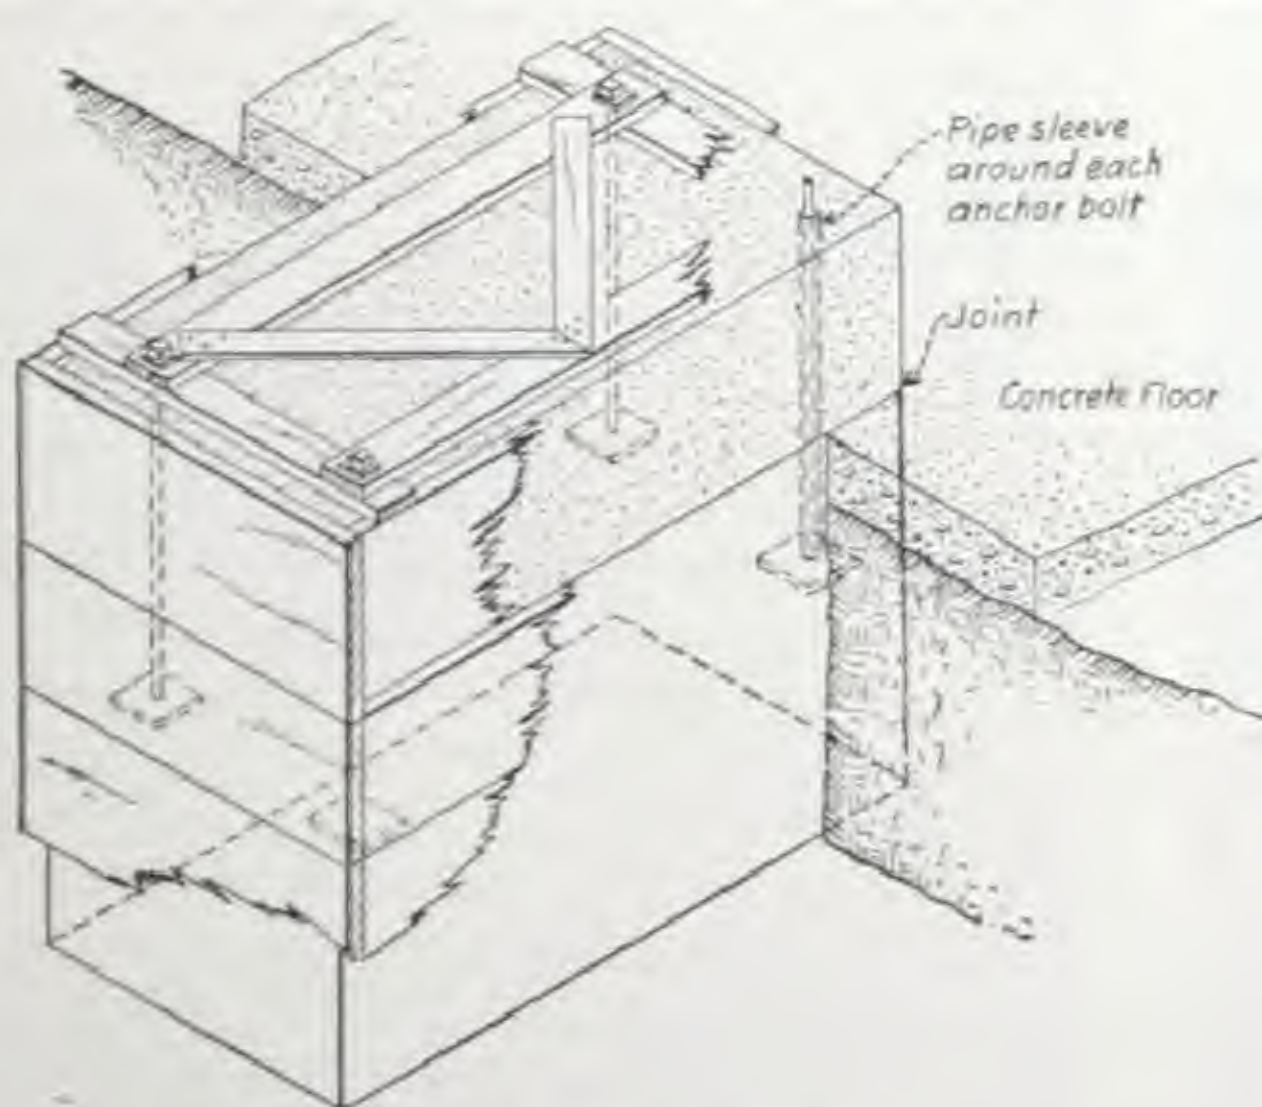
Forms, bolts, foundations, etc., for concrete engine base.
